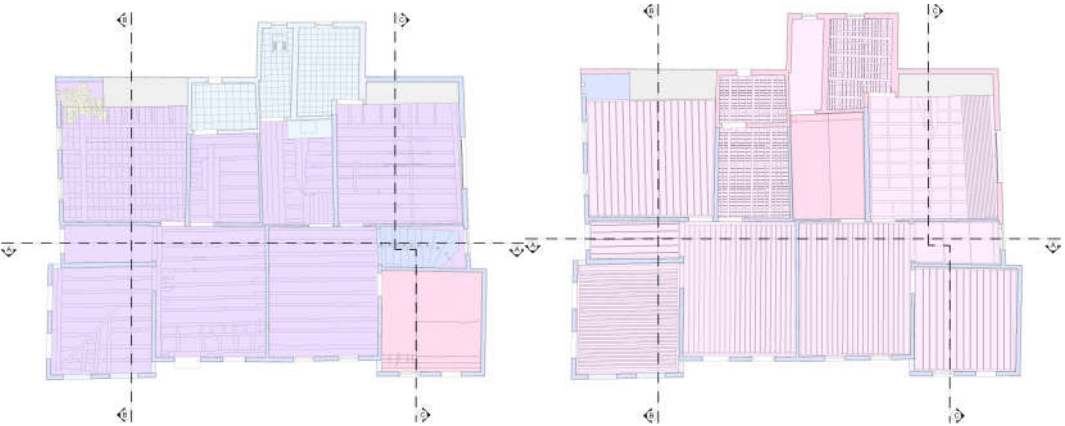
First Floor (Left) and First Floor Ceiling (Right) Damage Assessment Plan
